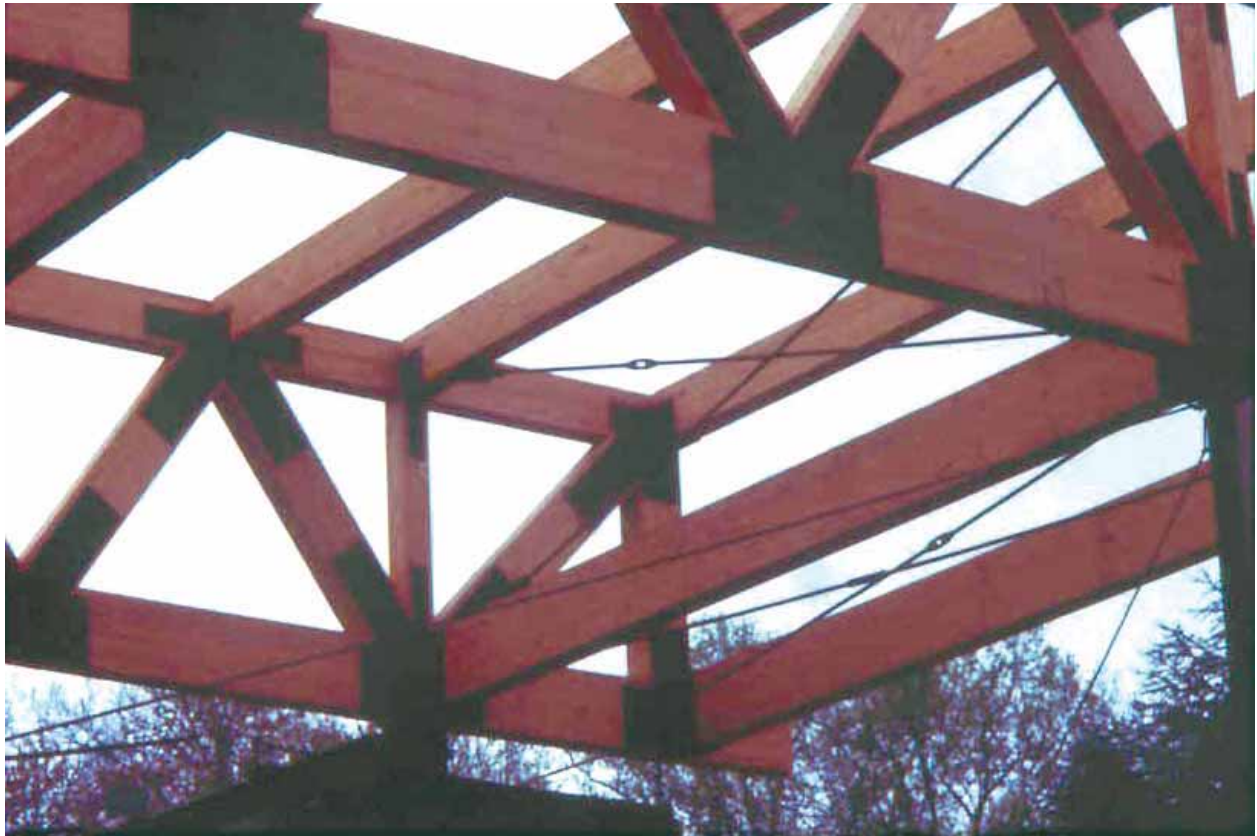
Heavy timber truss with steel cable web members. (Photo courtesy of Francis Brannigan.)
